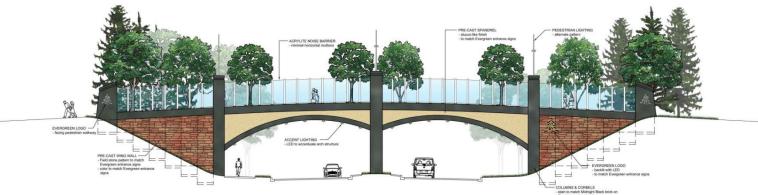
ELEVATION VIEW RENDERING OF GREEN BRIDGE
